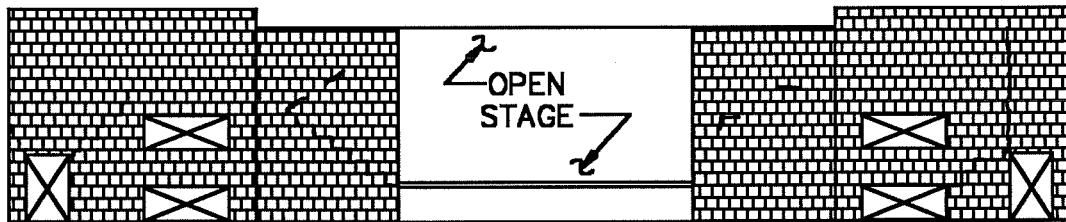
Loma Prieta Community Center - Observed cracks in east gymnasium wall
